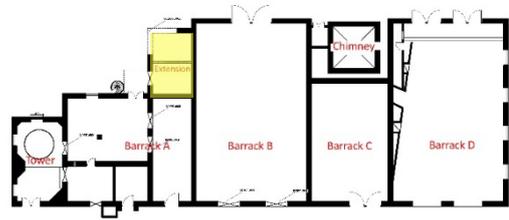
Termite Infestation - Roof, Extension, first floor, Barrack A, 15 to 17A, East Wharf, KPT, Karachi.
